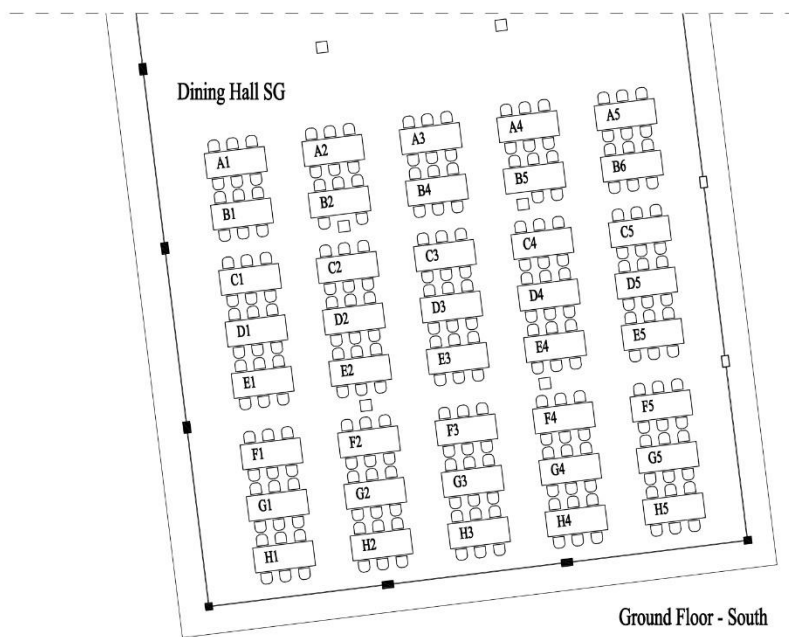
Ground Floor Plan and Temperature Data Notation of South Dining Hall
